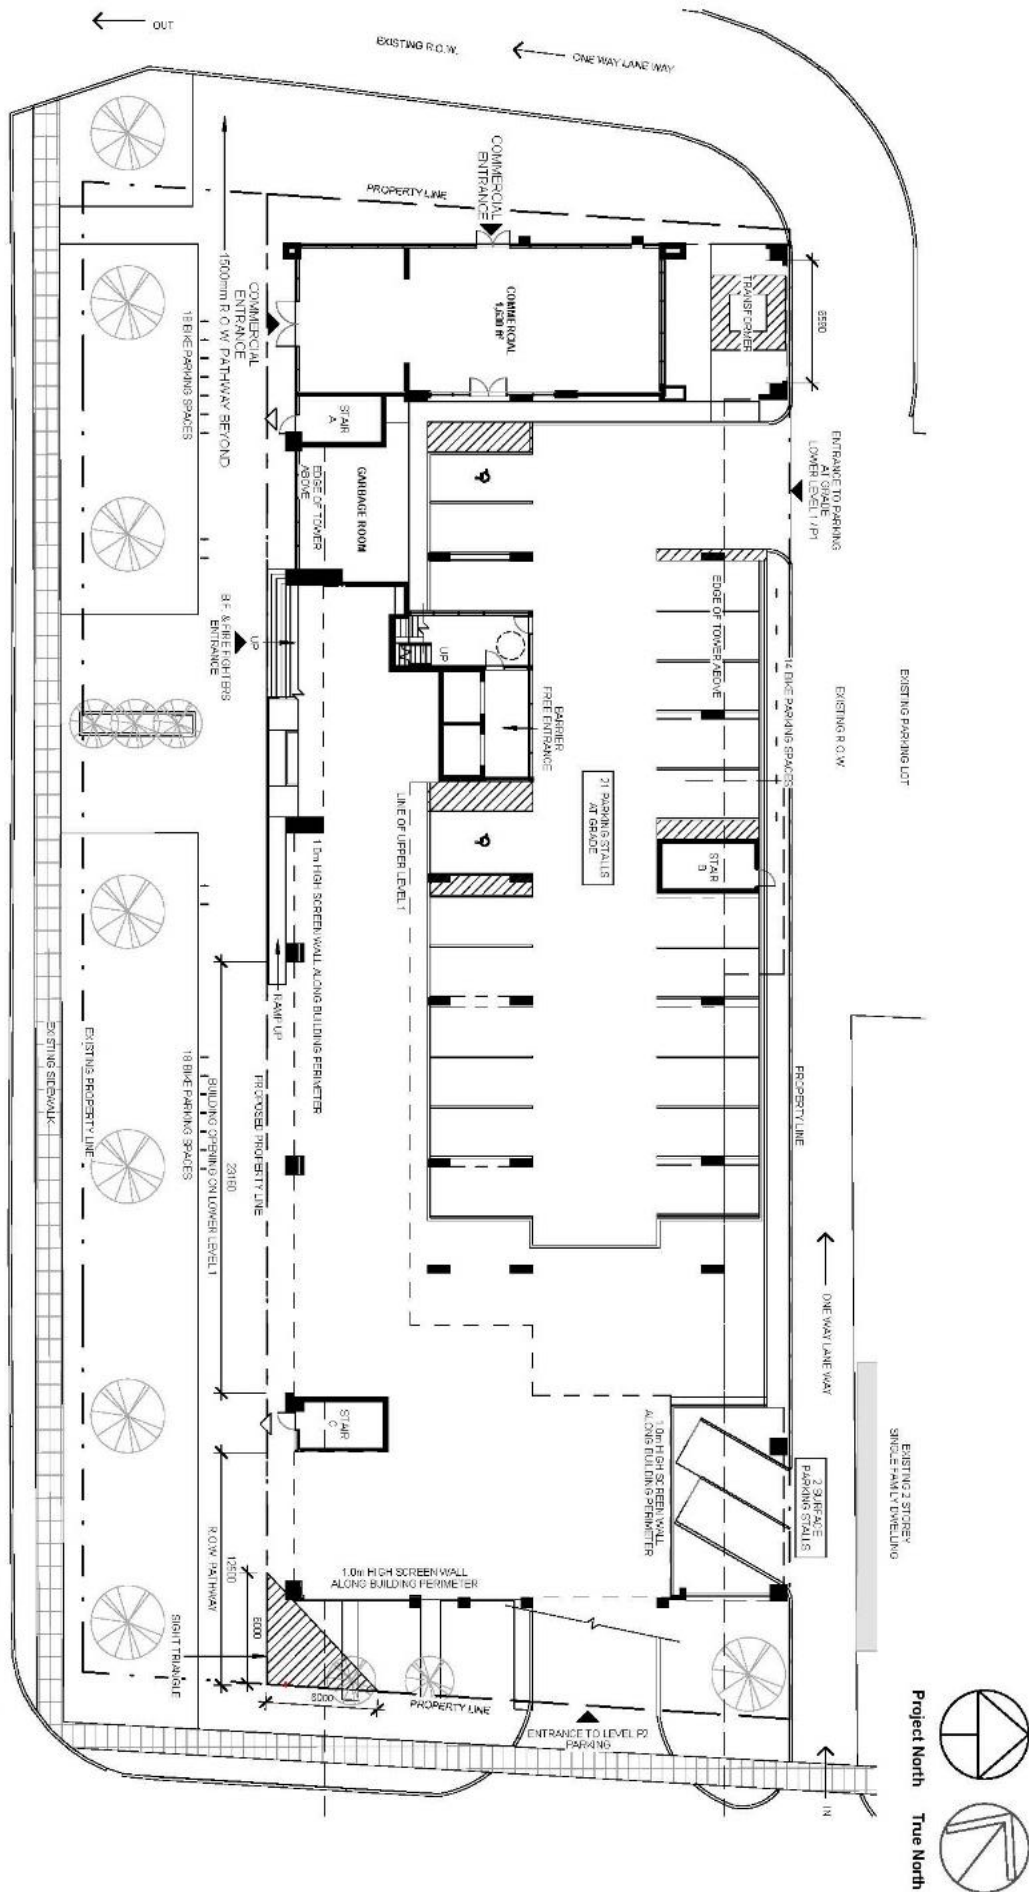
Illustration depicting the “lower” parking deck with access from a rear laneway to the east
